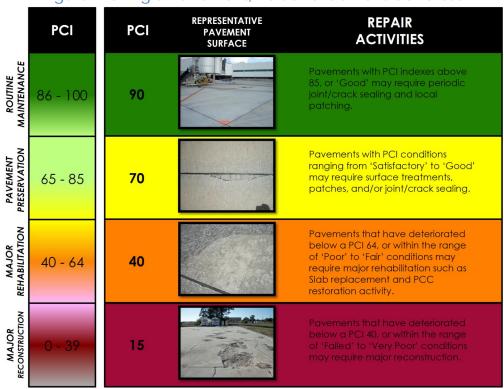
Rigid Pavement, Portland Cement Concrete
